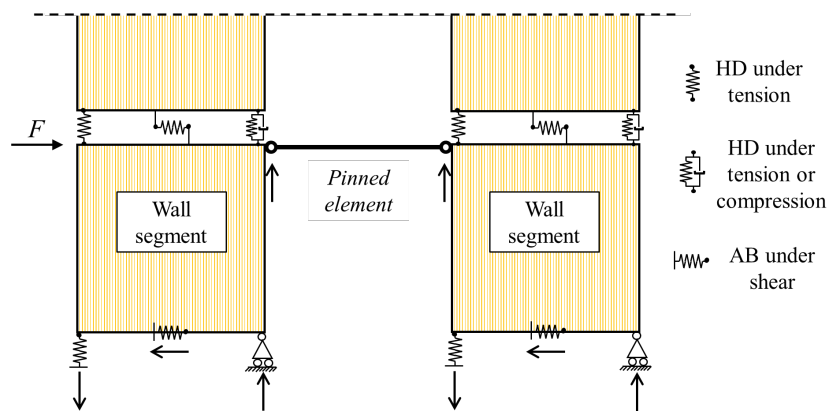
Simplified modelling strategy of multi-story CLT shear walls (SM).
